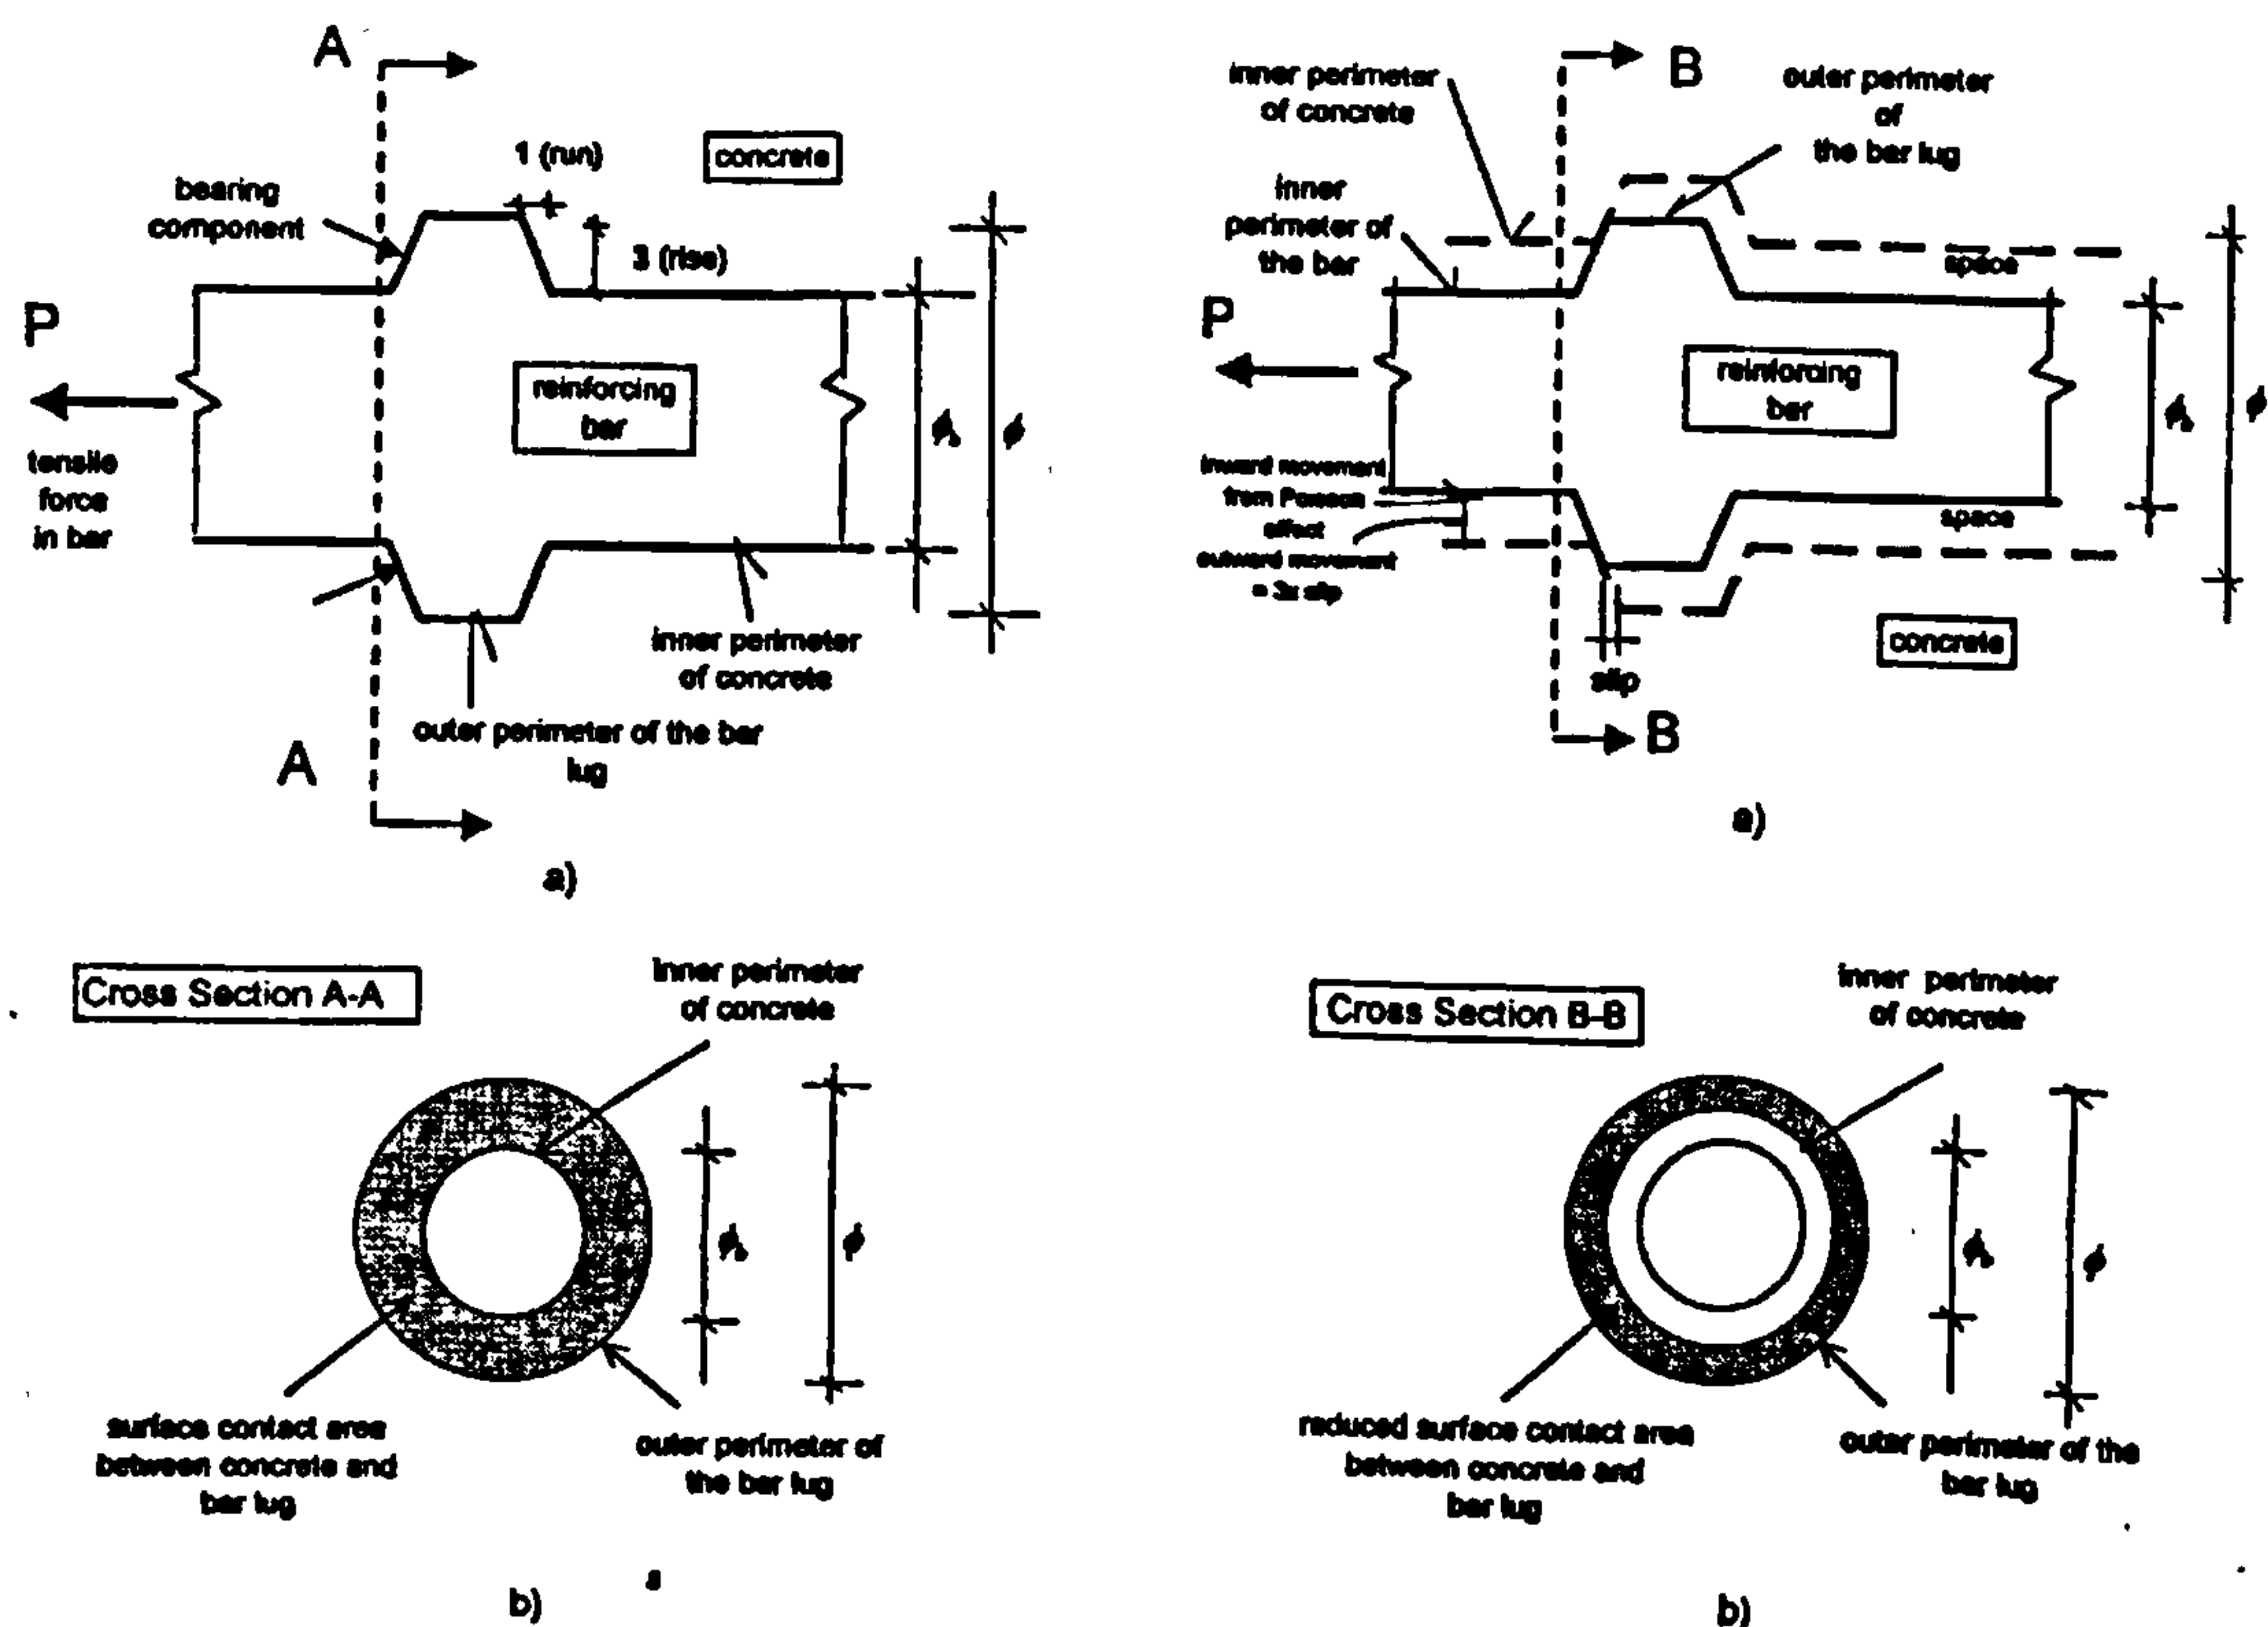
(a): Reinforcing bar and concrete geometry before cracking, (b): Contact area between concrete and reinforcement after cracking, (c): Reinforcing bar and concrete geometry after cracking, (d): Contact area between concrete and reinforcement after cracking
